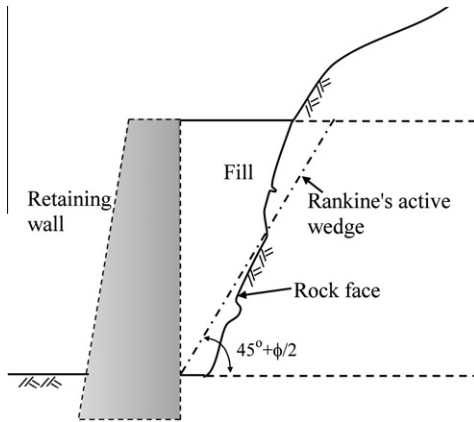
A schematic drawing of a RC retaining wall near a rock face.
